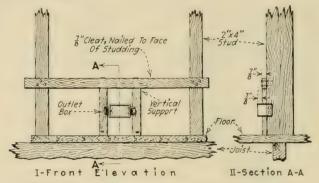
Installation of steel outlet box for baseboard outlet.
